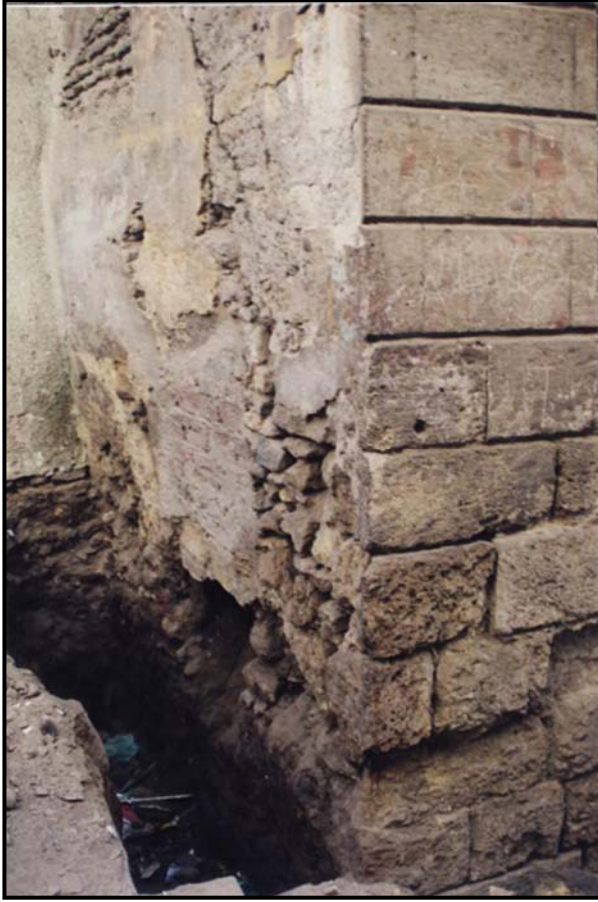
Bulging wall and dilapidated foundation of Bayt al-Sitt Awatif (Before intervention, October 1998)
